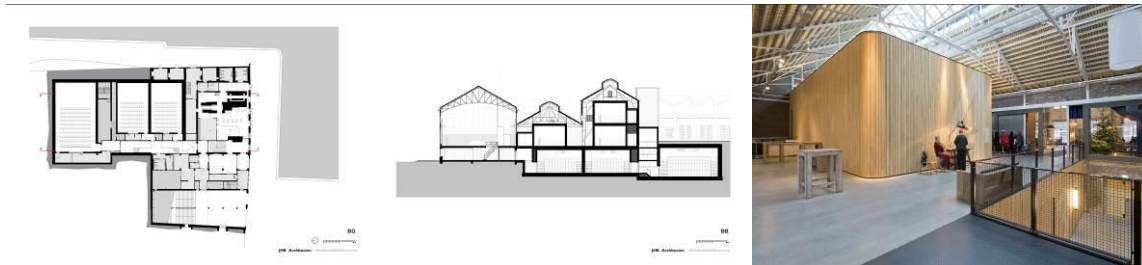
(a) Lumiere Cinema, floor layout; (b) Lumiere Cinema side layout; (c) Cinema and internal view
